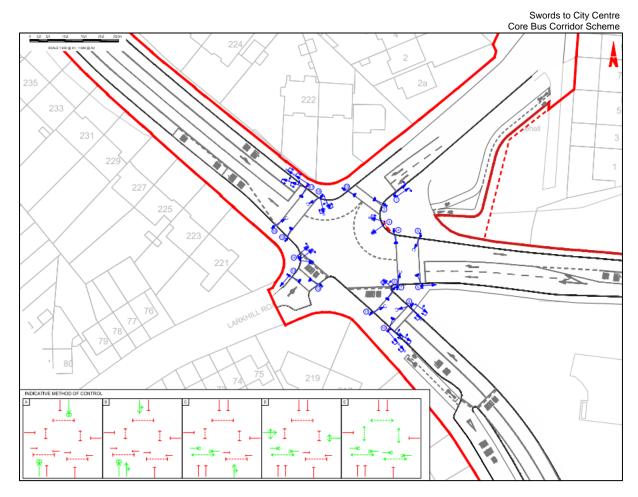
Proposed Junction System Drawing at Swords Road / Shanrath Road Junction (Sheet 21)
